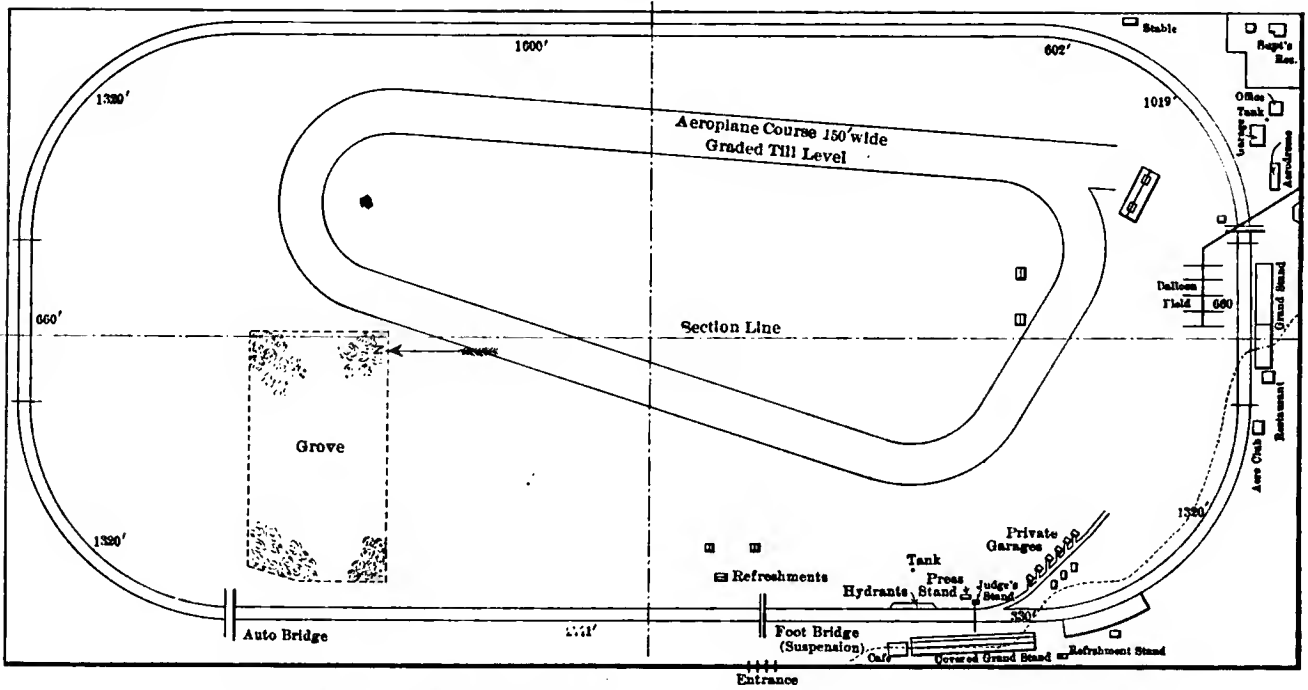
Plan of speedway, showing present track, location of bridges, buildings in place, and other details
